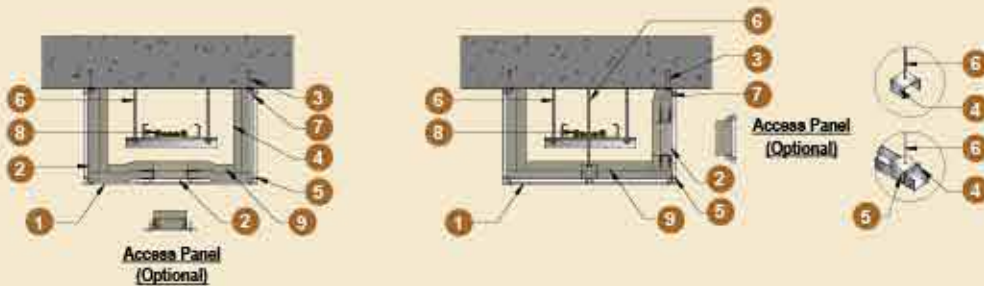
THREE-SIDED CONSTRUCTION FROM FLOOR SOFFIT
